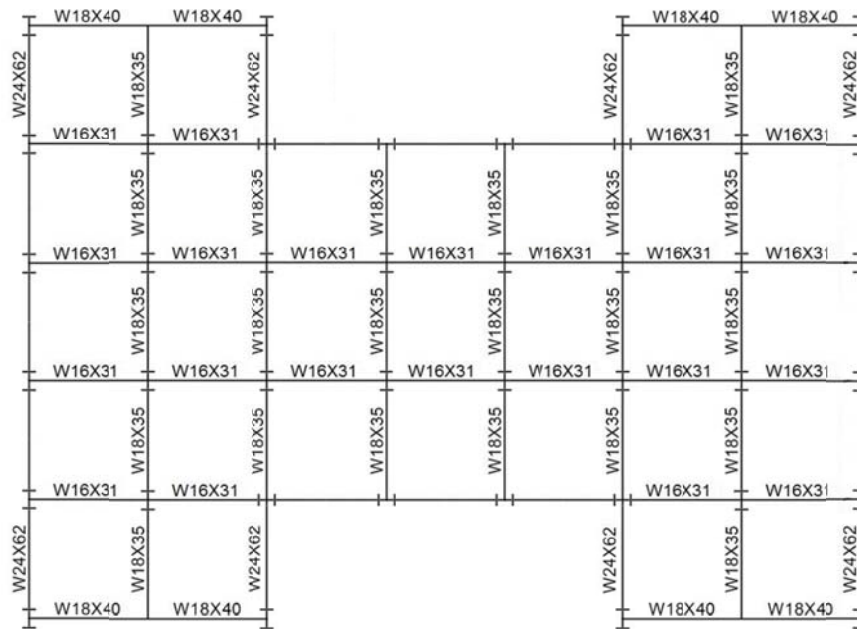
Plan View – 2<sup>nd</sup> floor
